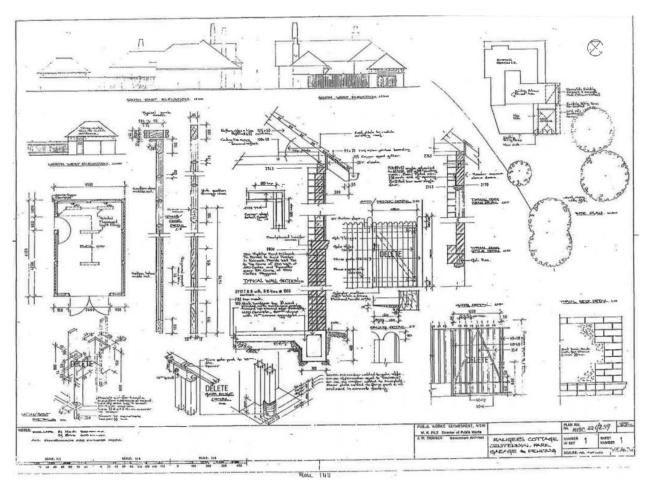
Plan showing the new garage to the rear of the Ranger's Cottage, completed in cl 989, MISC226/259 (NSW Department of Commerce Plan Services).
